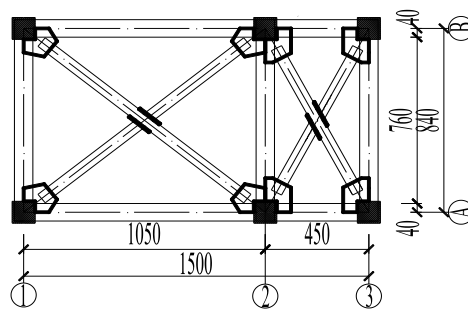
Plan of structural plane layout and bottom Bracing (Units: mm)
